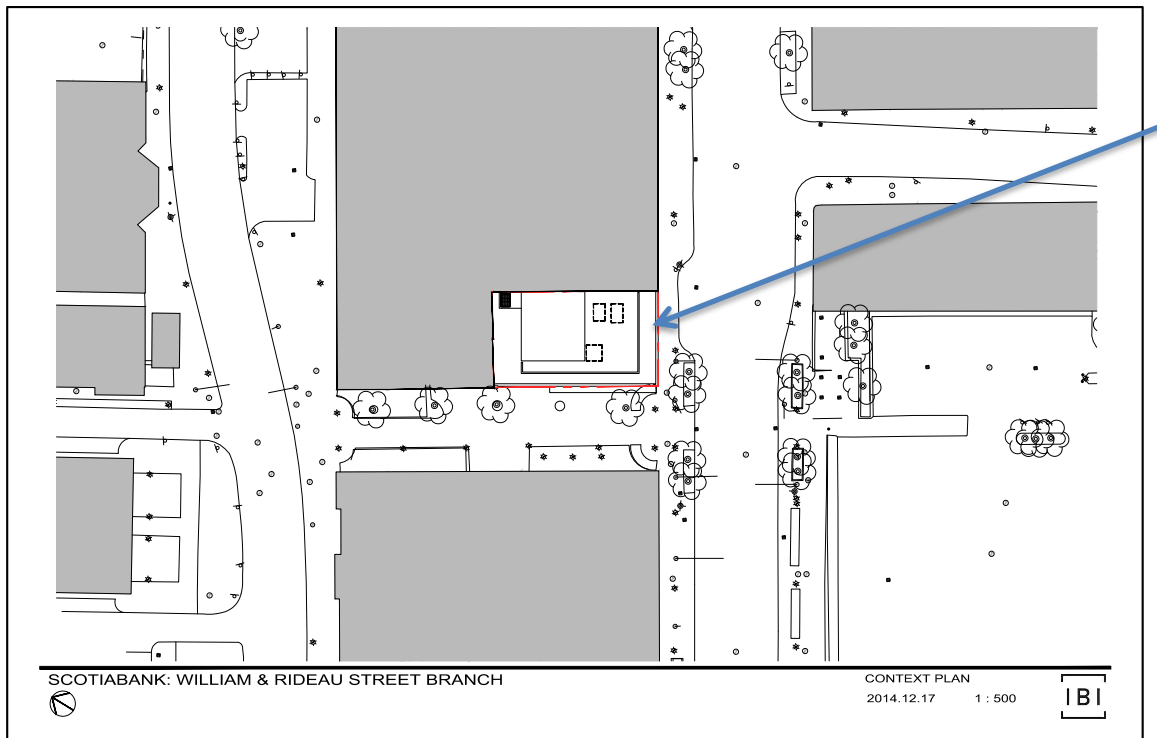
Site plan for proposed infill building at 117 Rideau St. (Source: IBI Group, 2015)
